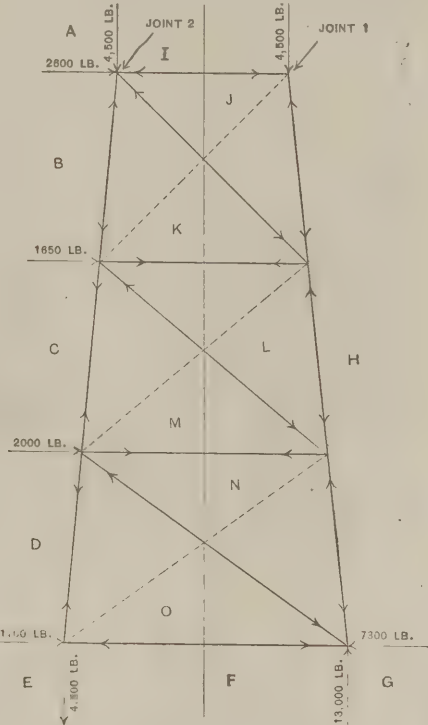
Frame Diagram when the Tank is Full of Water.—Scale, 1/10 In. to the Foot.
